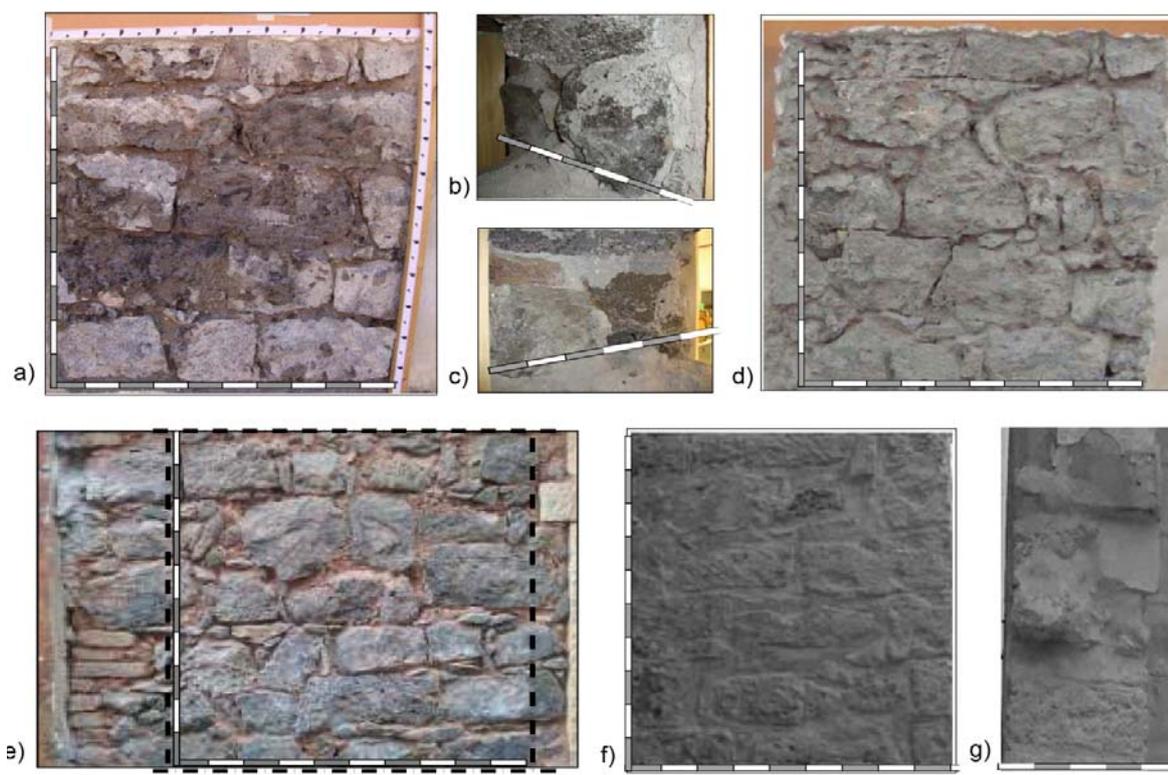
Some samples of rough cut blocks in lava stone masonry analyzed in this study: (a -d) masonry textures and cross sections, in a school in Paternò (CT); e) masonry texture in an housing for undergraduate students, Catania; (f-g) masonry texture and cross section, in a municipal building, S. Gregorio, (CT).
